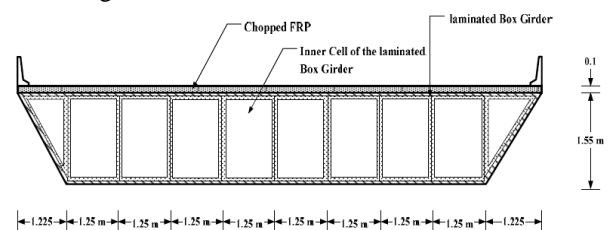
Deck section of the simply supported two lane FRP bridge
